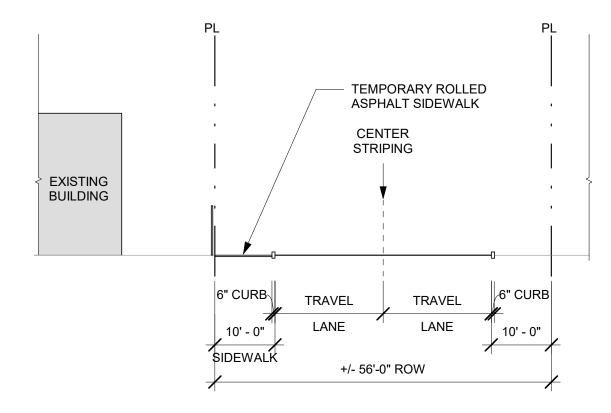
EXHIBIT E - STREETSCAPE OVERVIEW - INTERIM PLAN
